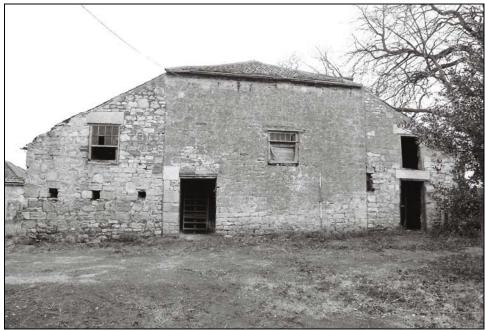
, 46: view of the north elevation with the two appended extensions, from the north
